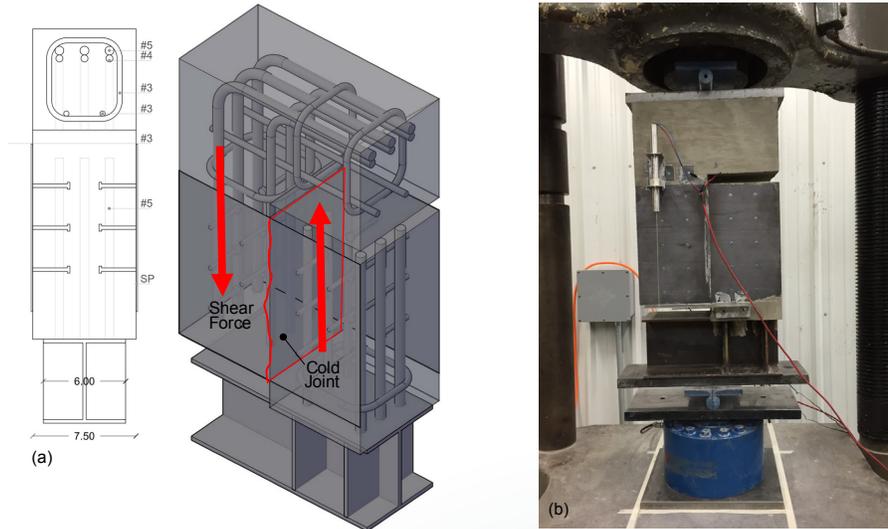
Small-scale push-off specimen: (a) specimen consists of two L-shaped concrete placements with a cold-joint boundary running vertically, with the two placements joined by steel composite plates on two opposite sides of the specimen and (b) the specimen is loaded in a compression fixture, which generates shear across the cold-joint boundary. The slip along the cold-joint boundary is measured with two linear variable differential transformers.
